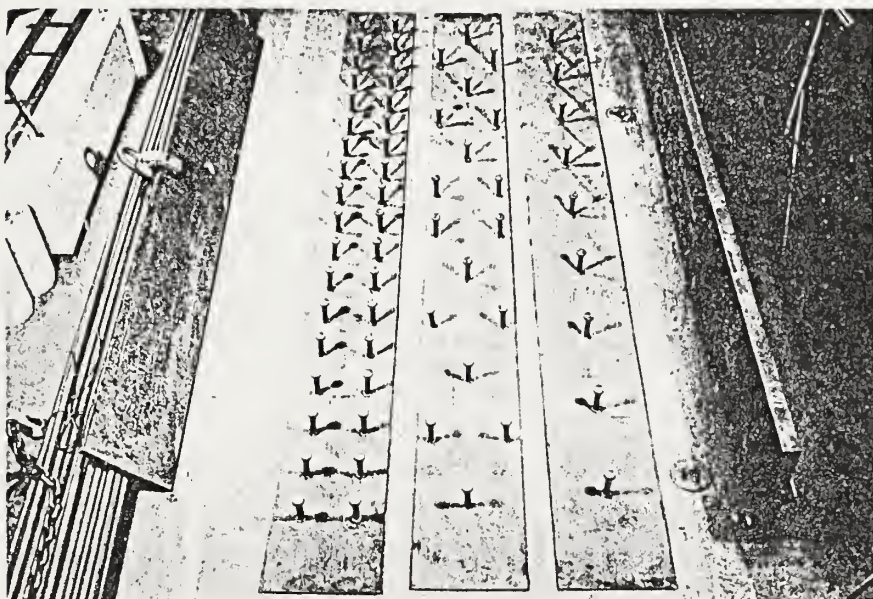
, Plate Reinforcement Assembly used by Casillas, et.al.
